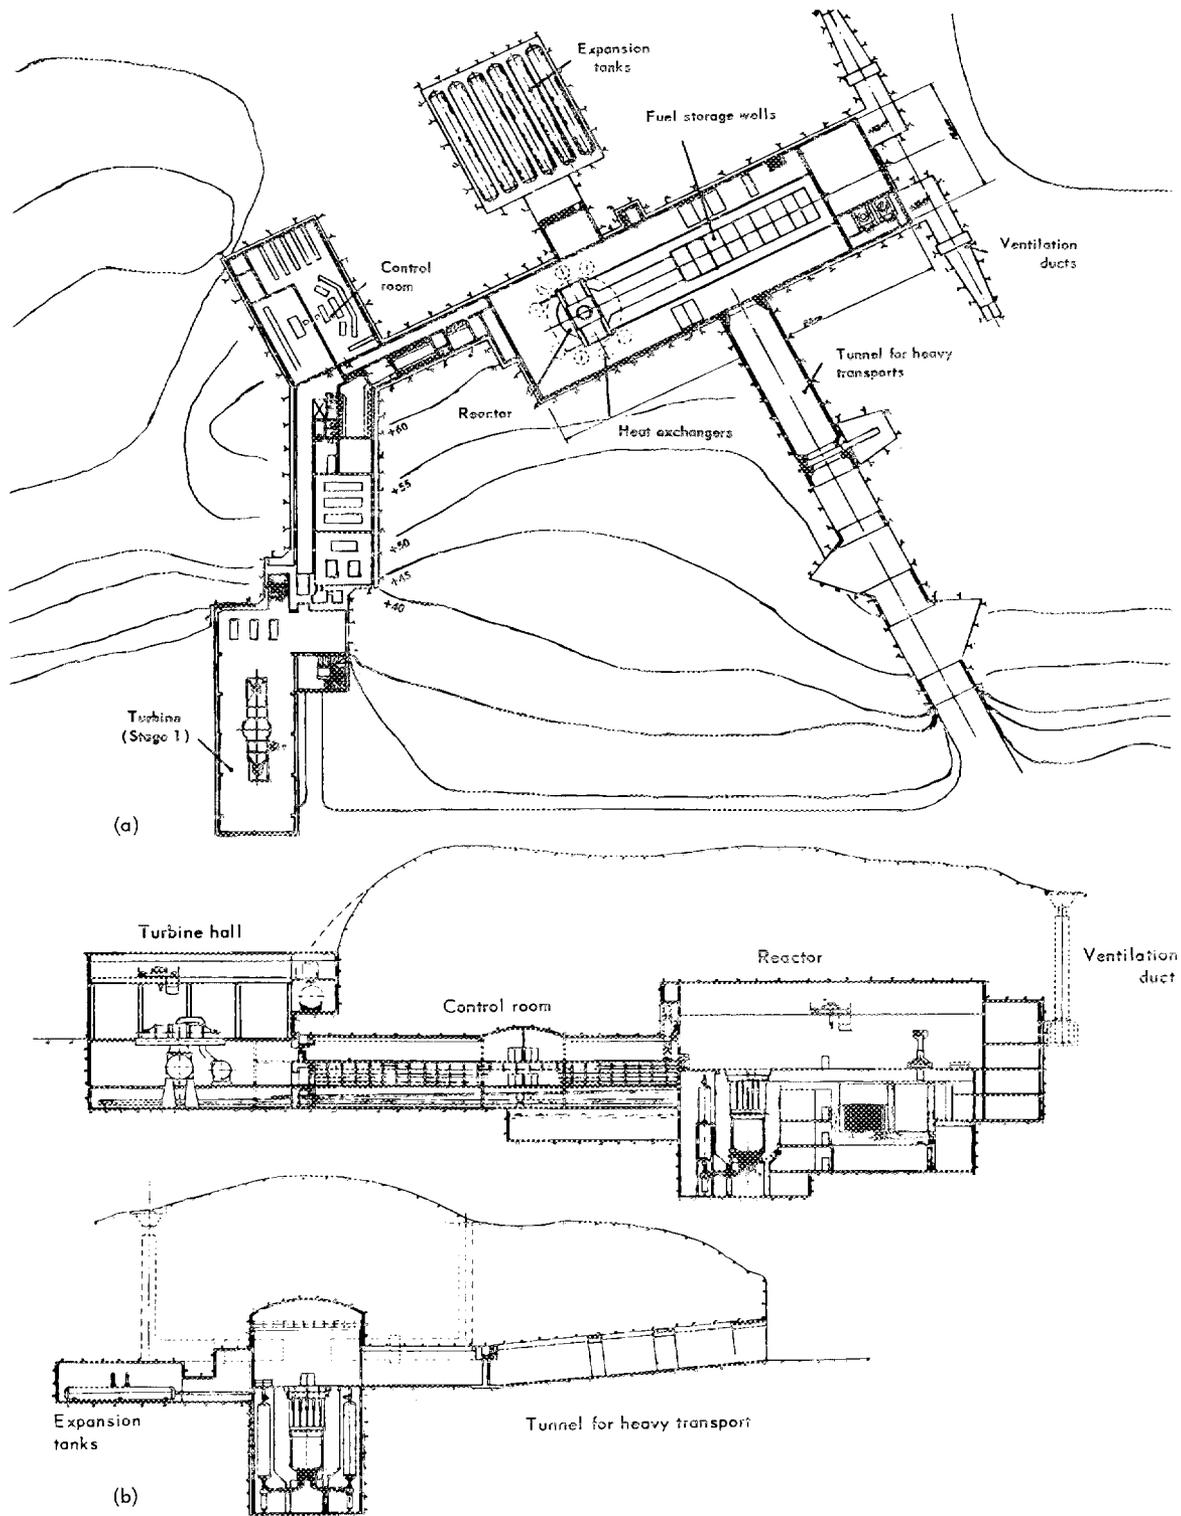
Typical Reactor Container Built in a Cavern Excavated in Rock; the R-3 Plant, Sweden. (a) Horizontal section. (b) Vertical section. (From ref. 4)
